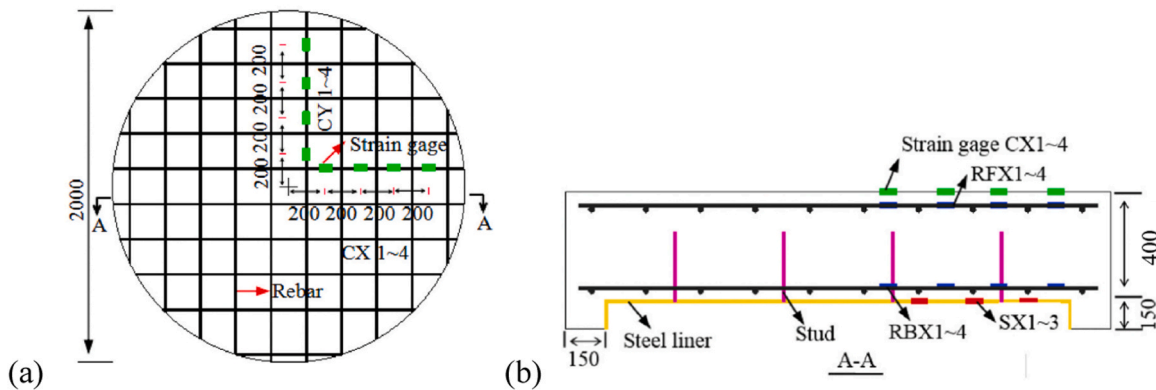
Dimension of composite panel. (a) Front view (b) Side view (unit: mm) [49].
